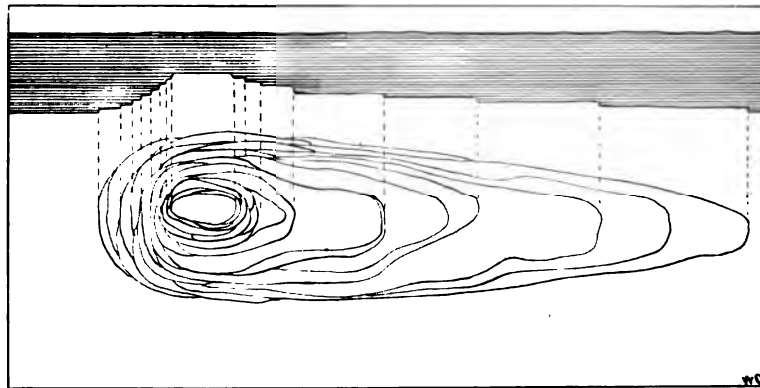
A Vertical Section and Horizontal Plan of a "Choke-out" in the Roof of Entry, as seen in Mine at Weir City. This is due to percolating waters loosening the roof, which keeps falling, each succeeding lamina breaking off short of the preceding, thus forming a natural arch.
